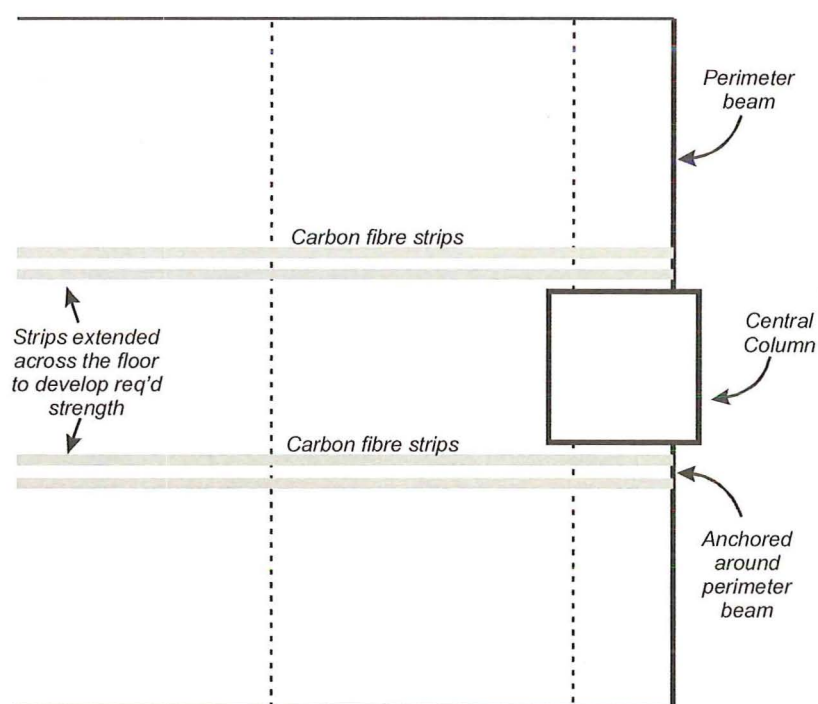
Plan view showing the placement of carbon fibre strips around untied columns
